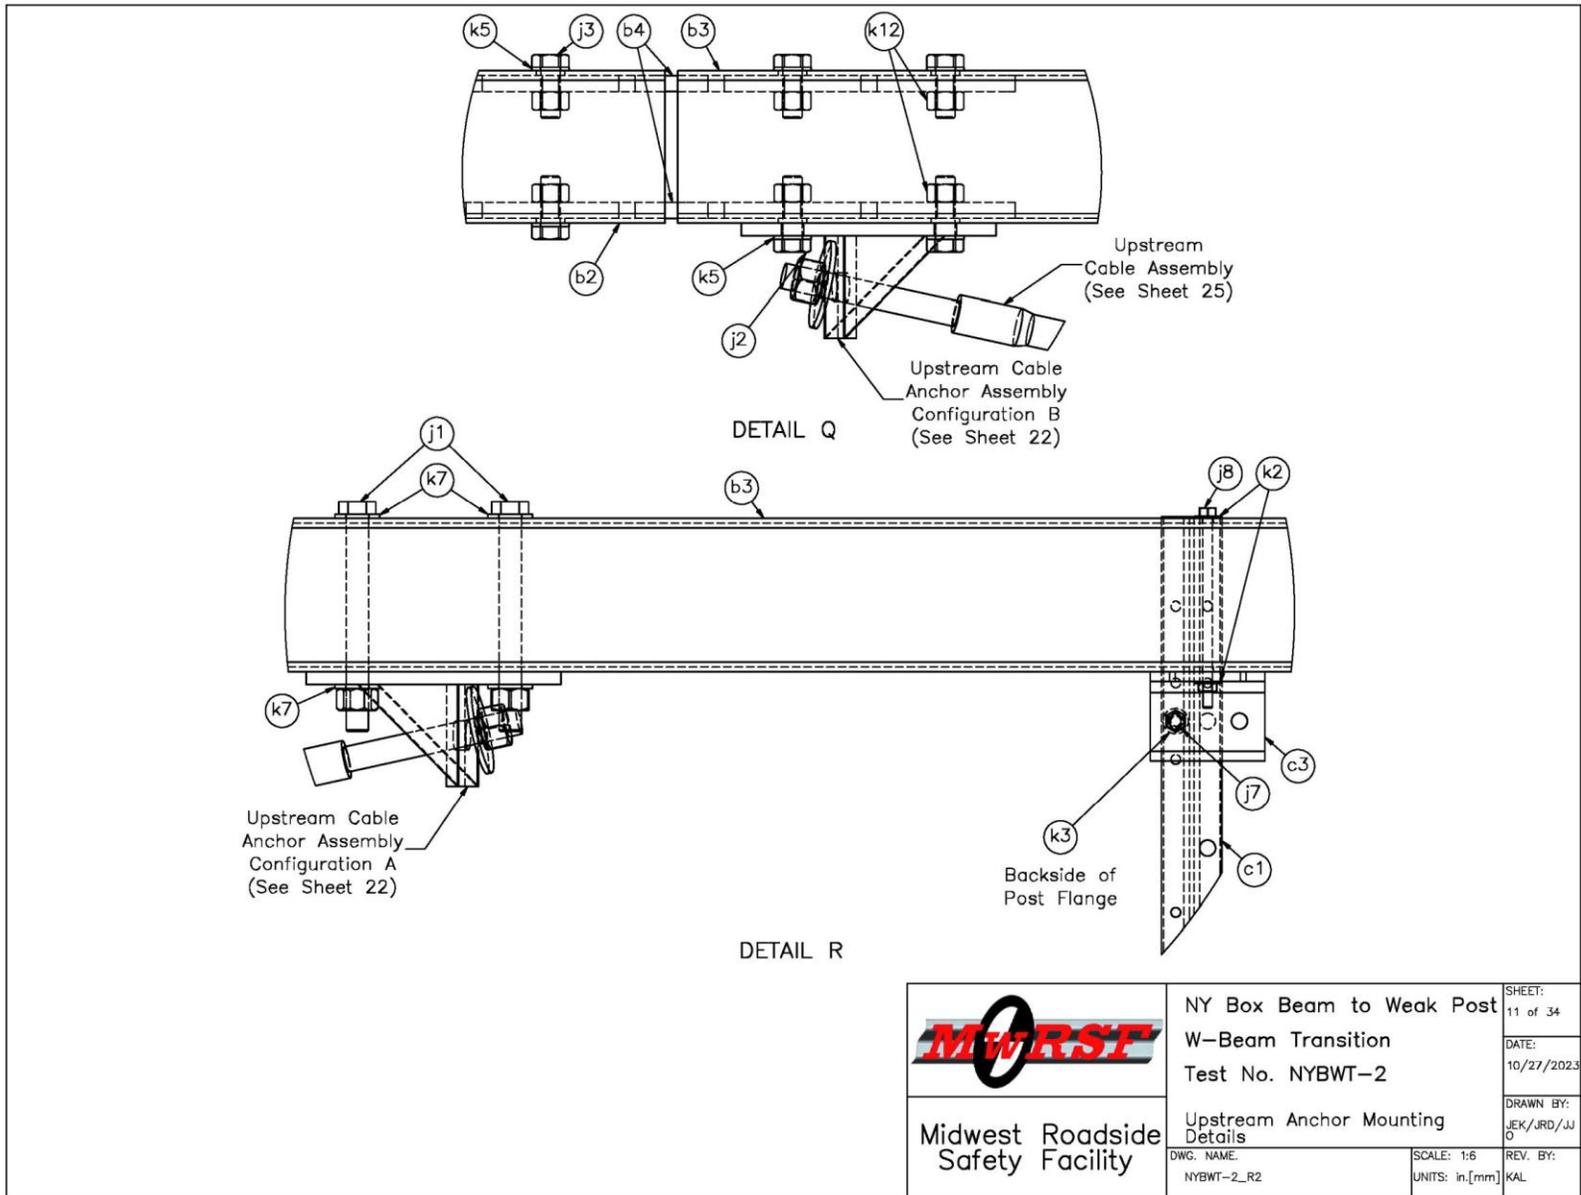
Upstream Anchorage Details, Test No. NYBWT-2
